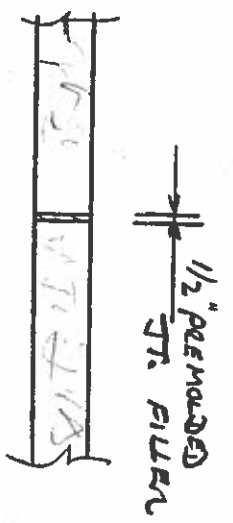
TYPICAL SIDEWALK CONSTRUCTION
